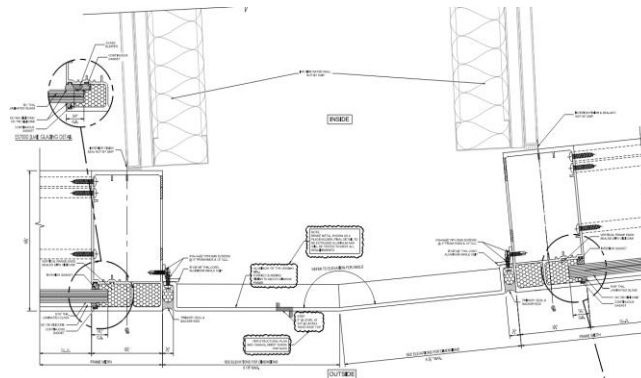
Plan Detail of Brake-Metal Closure between Adjacent Sliding Glass Door / Window Frames at the Balcony.
